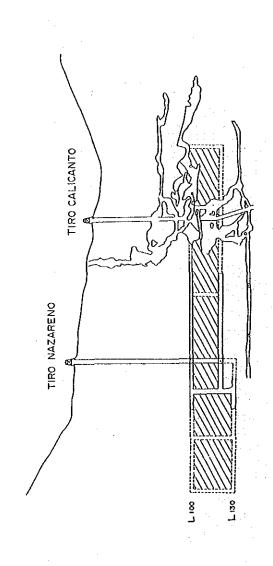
3. 16. b Calicanto -Plane and Section-
